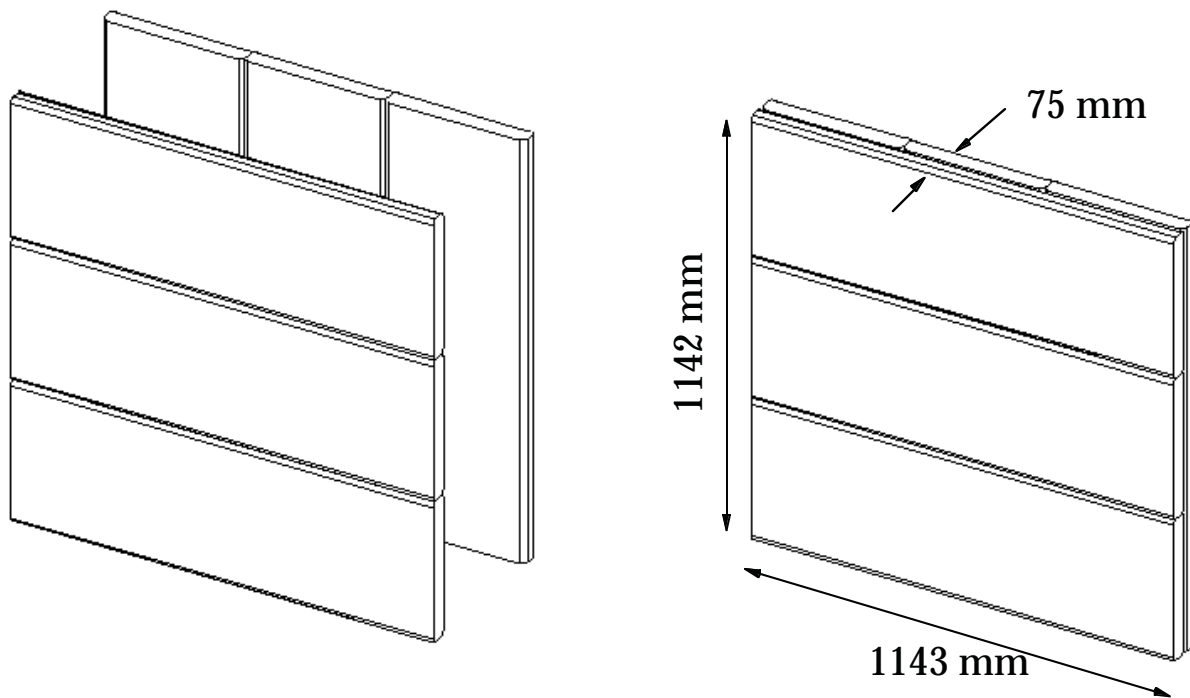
Specimen L30, a double layer built-up lumber specimen consisting of six “2x12” planks. Both dry and wet specimens were tested.
